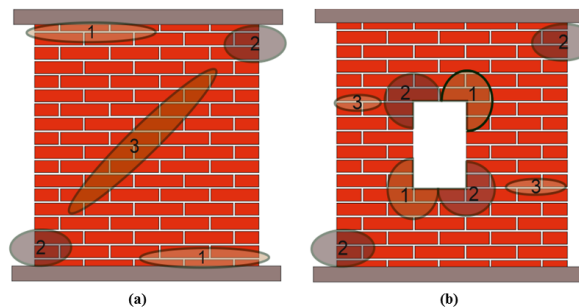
The reasons of the cracks on the masonry walls
